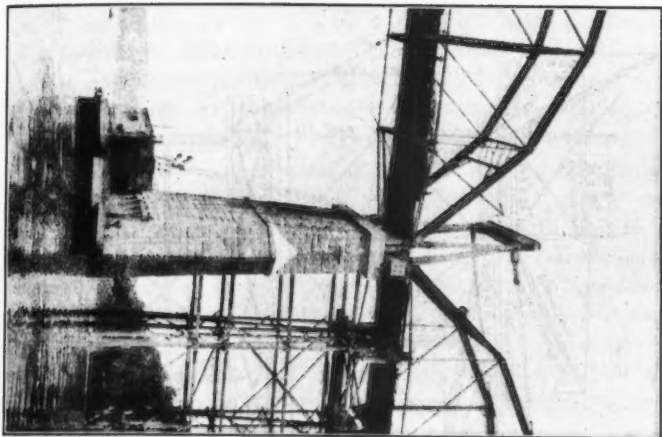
PIER GARDEN BEING LIFTED FROM DAMME.
